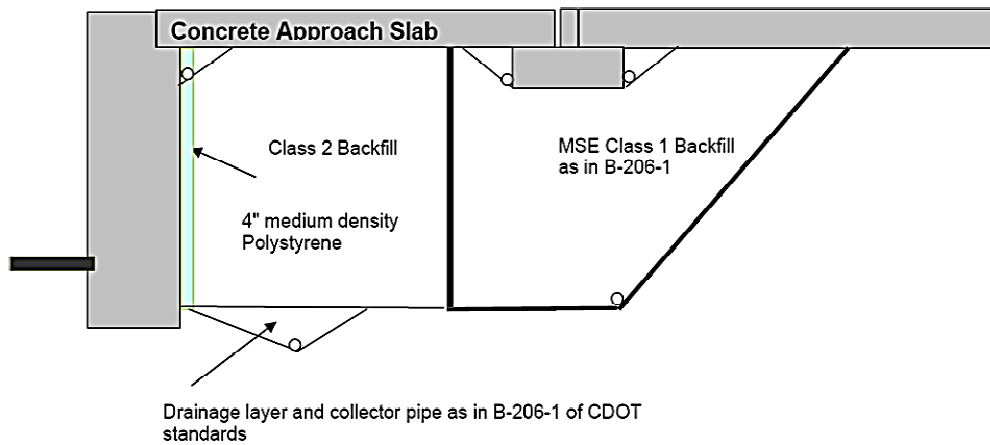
MSE walls system under bridge approach slab (Abu-Hejlah et al., 2006)
